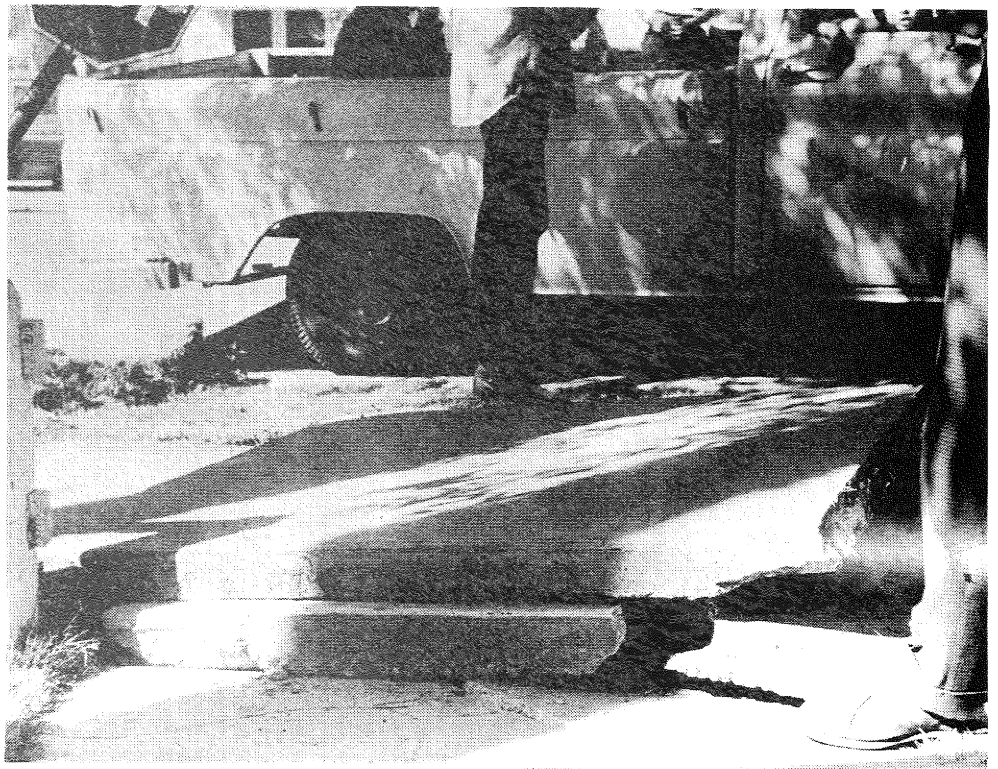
Overthrust sidewalk in Orange Grove Avenue. Compression of ground has forced the upper slab out of the pavement.
